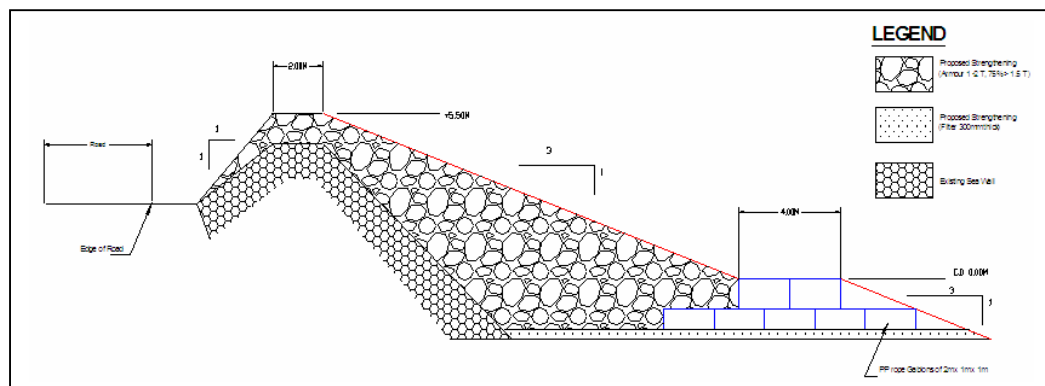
Typical cross section of sea wall with Toe Gabions
